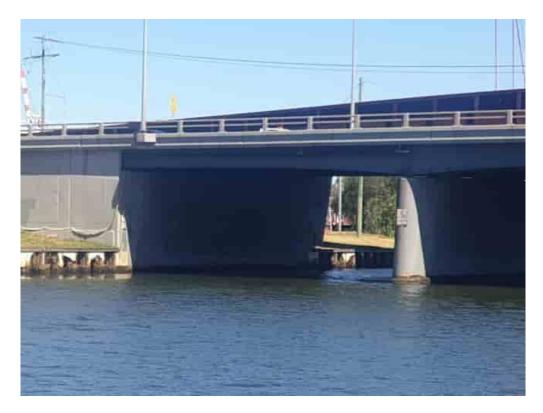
Footscray Road bridge from the western bank, facing east towards the eastern bank (photo taken in 2023)
